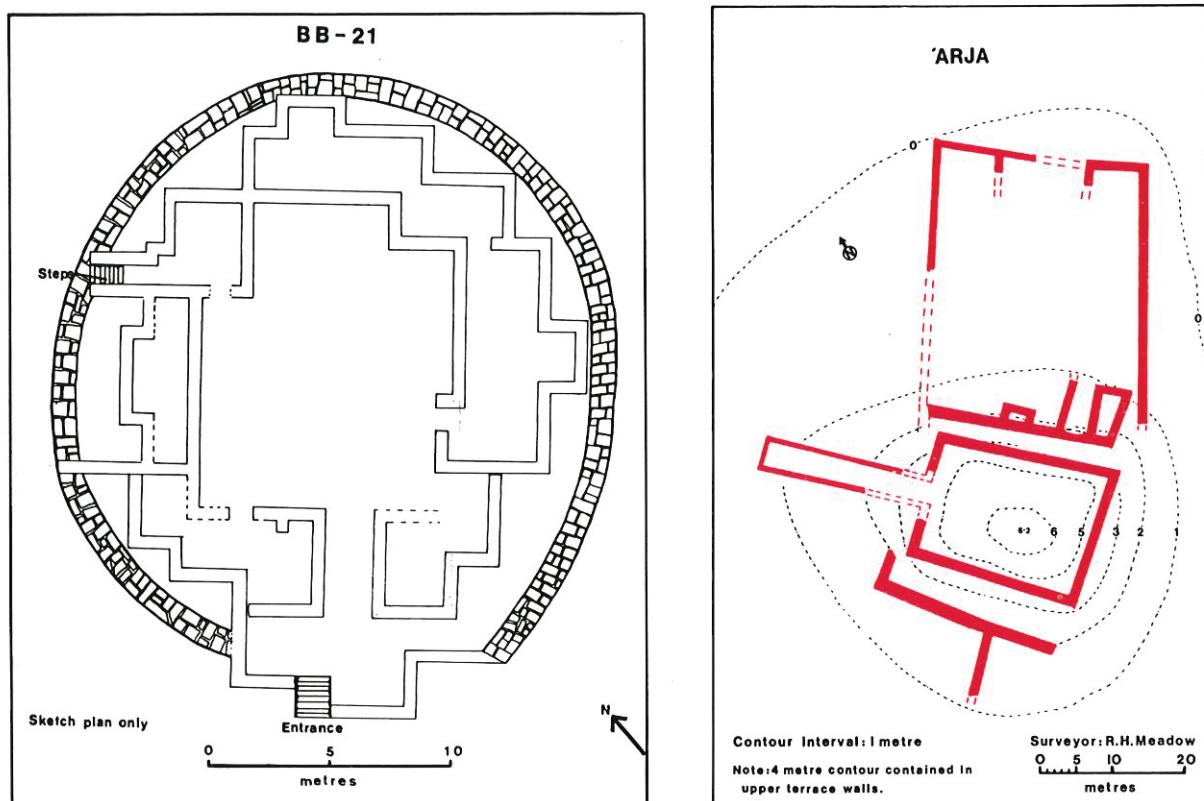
(left). Sketch plan of structure BB-21. (Right) Plan of structure at 'Arja'.
